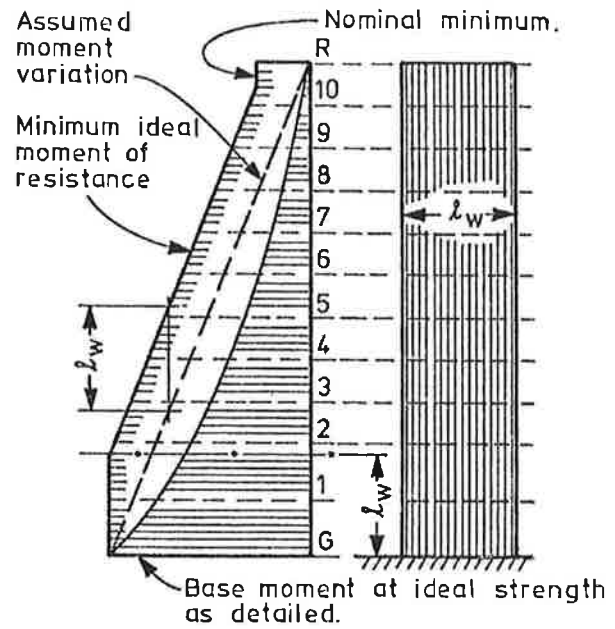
RECOMMENDED DESIGN BENDING MOMENT ENVELOPE FOR CANTILEVER SHEAR WALLS
